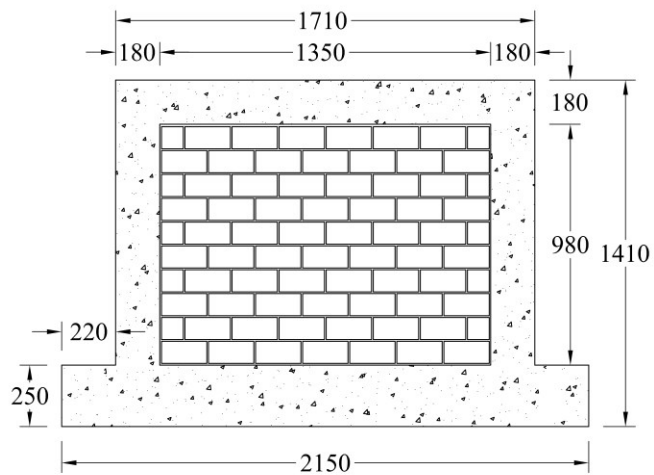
Geometric properties of infilled frame specimens and reinforcement details in the RC frame
